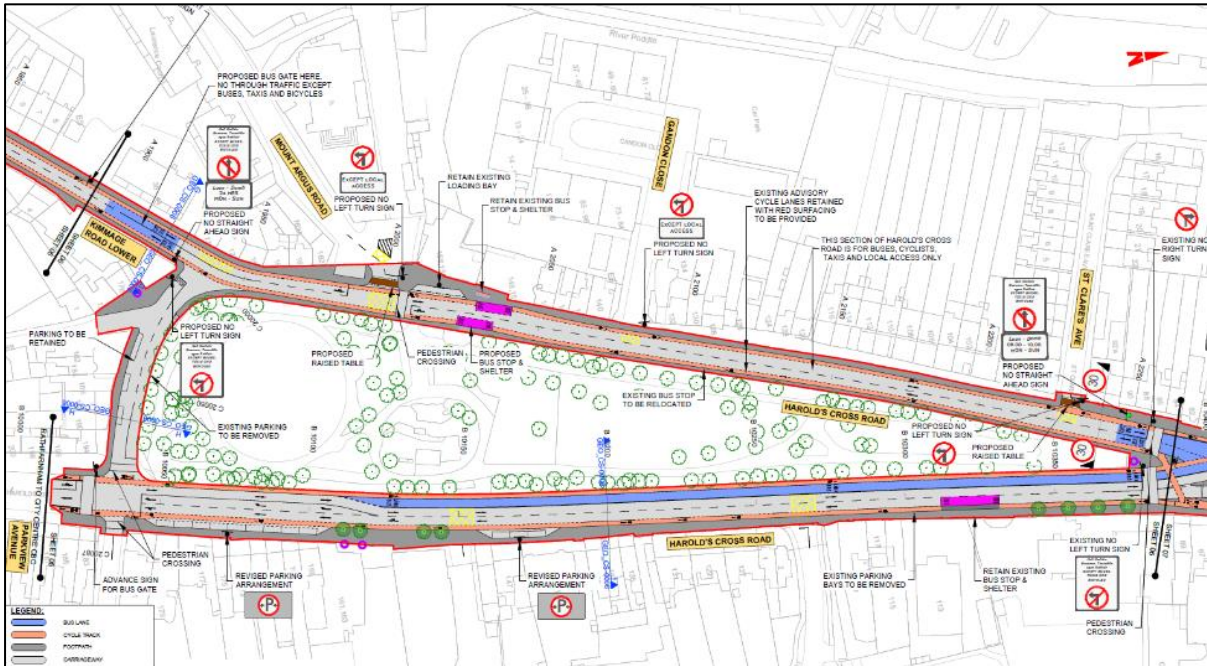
Extract from General Arrangement Drawings (Sheet 6)
